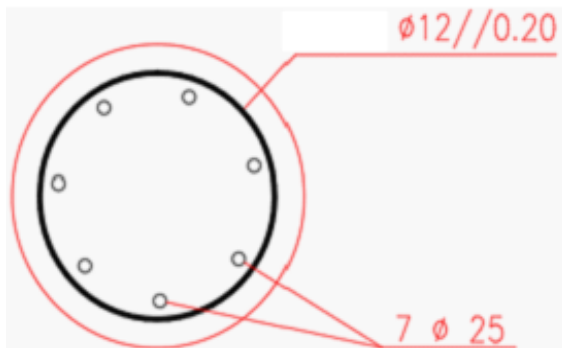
PROPOSAL FOR THE PILES' REINFORCEMENT
